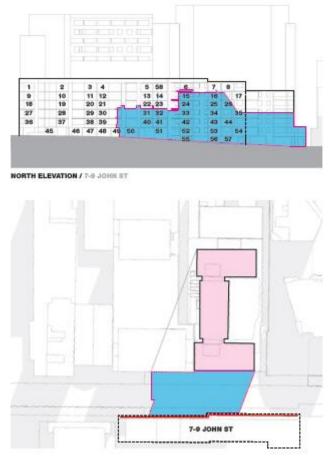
Elevation shadow diagram of 7-9 John Street/208-210 Coward Street at 10am
